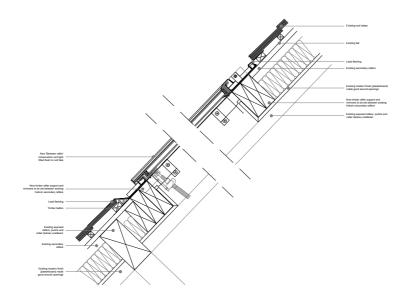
'Between-the-rafter' conservation roof light detail sketch section
